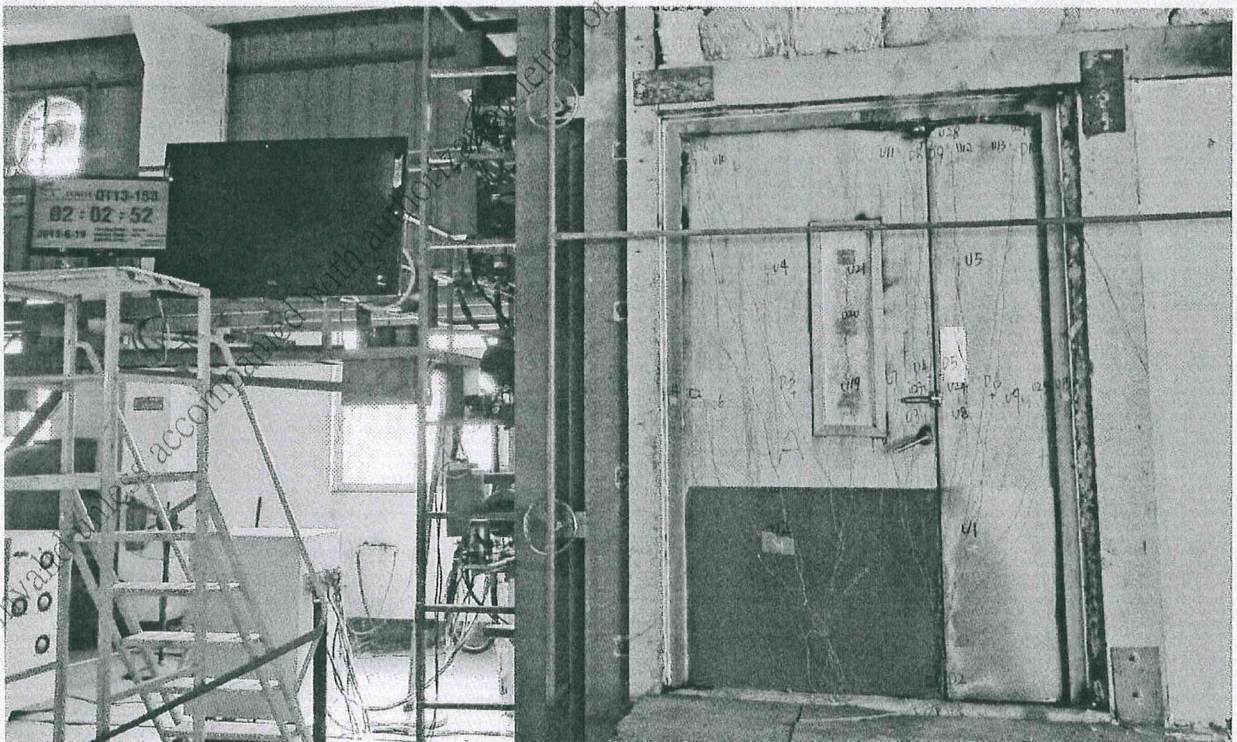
Unexposed surface of the specimen at 120 minute of test. (Door A)
